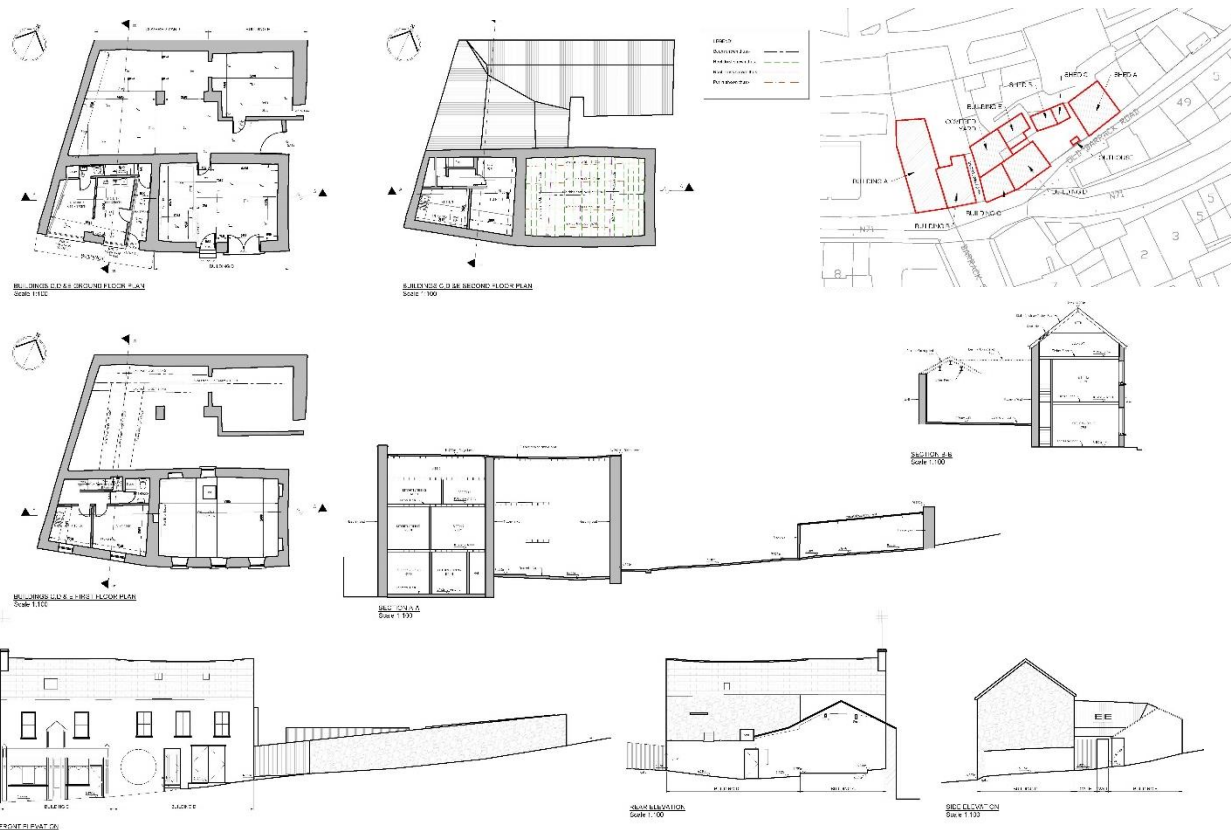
Existing plans, elevations, and sections of Building C and D, Cork County Council (2023)
